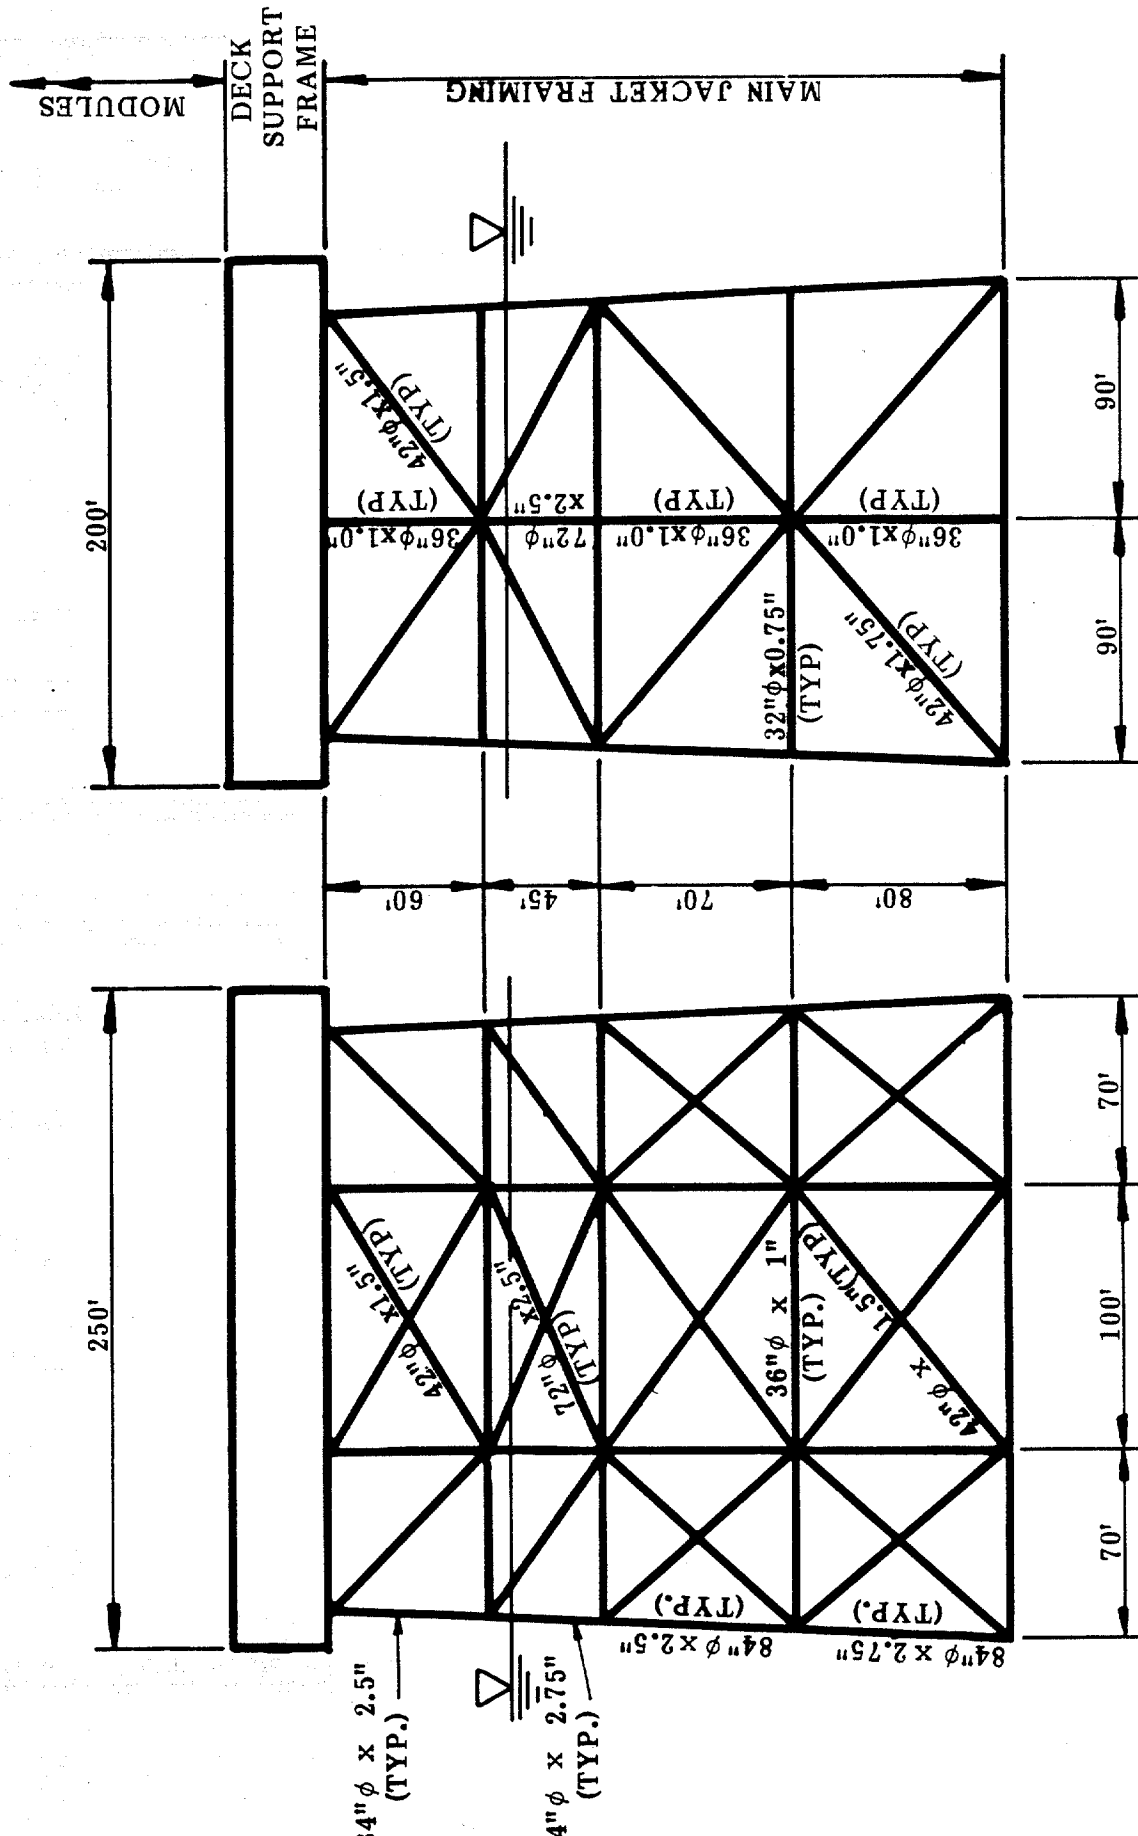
JACKET LAYOUT FOR HYBRID PLATFORM, 300FT WATER DEPTH
